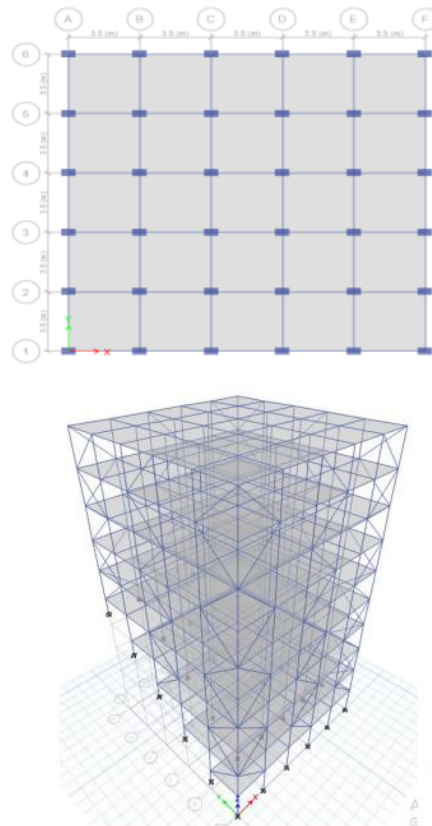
Plan and 3D Model of Sloped Building with Diagonal Bracing
